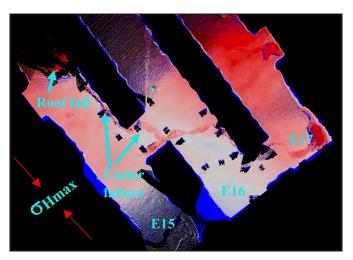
3D LiDAR scans of the roof in the same entries as Figure 11, showing cutter development, with red indicating higher roof elevations or areas of roof damage
